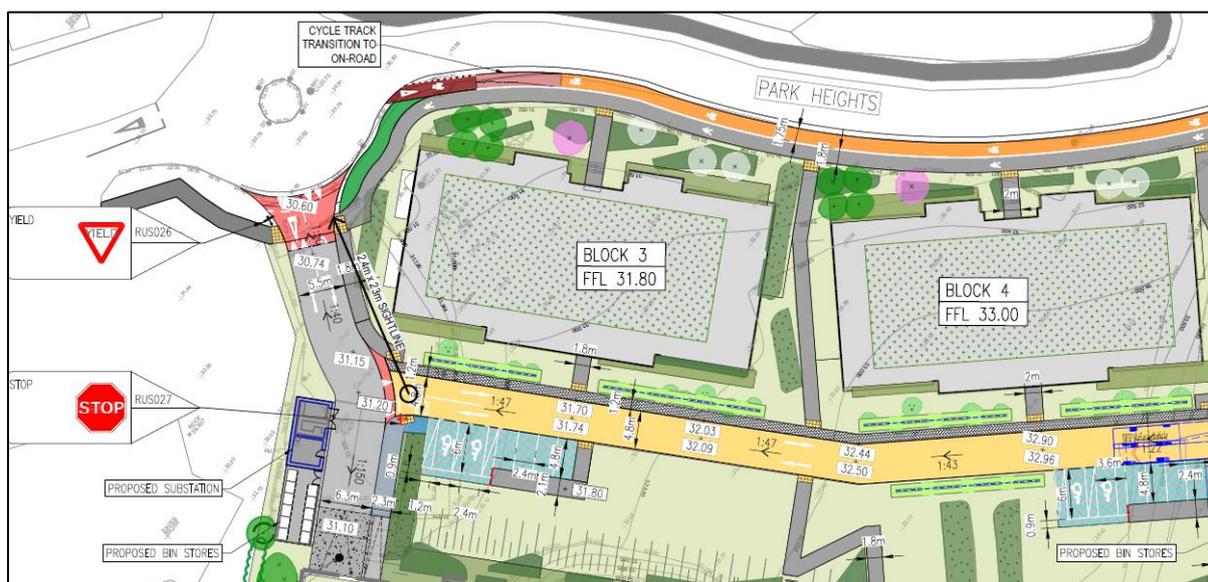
Extract of Road Layout Plan Showing Contrasting Materials in Homezone
